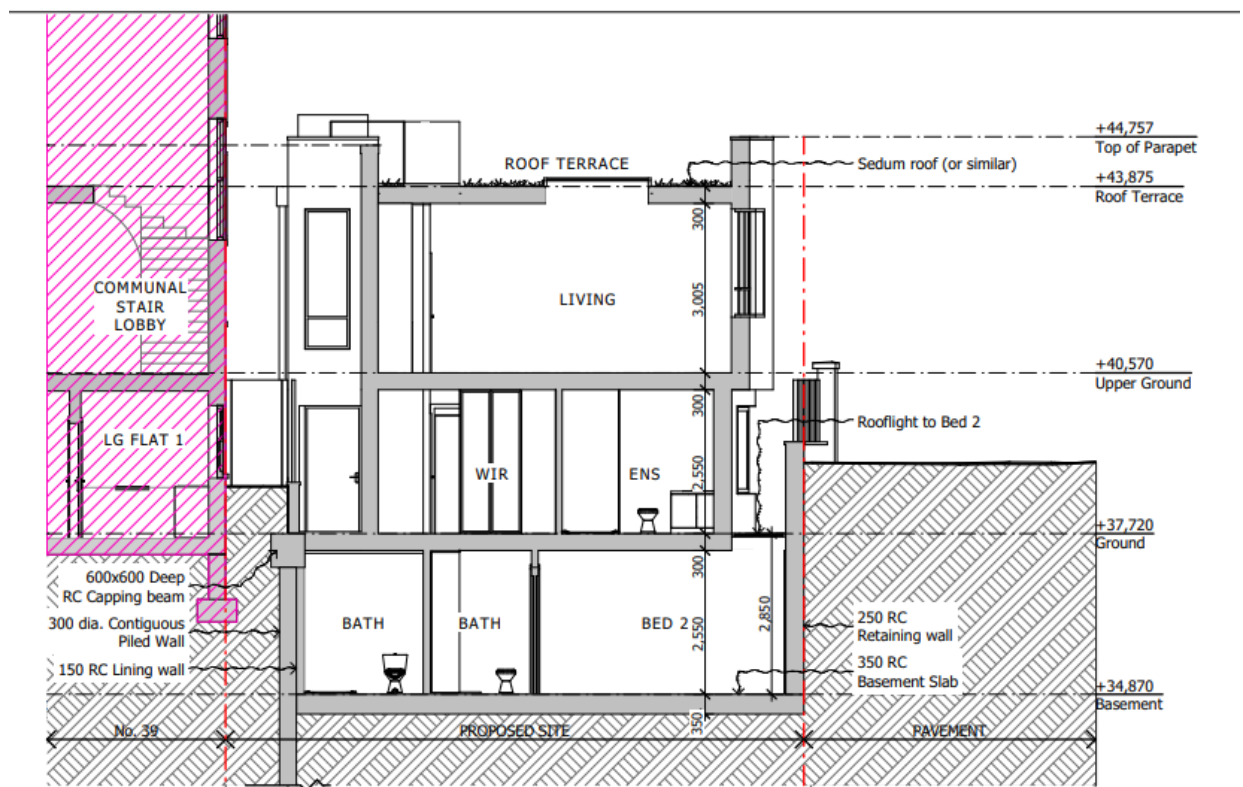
Proposed section AA of the subject site, illustrating the extent of the proposed basement extension and increased depth.
